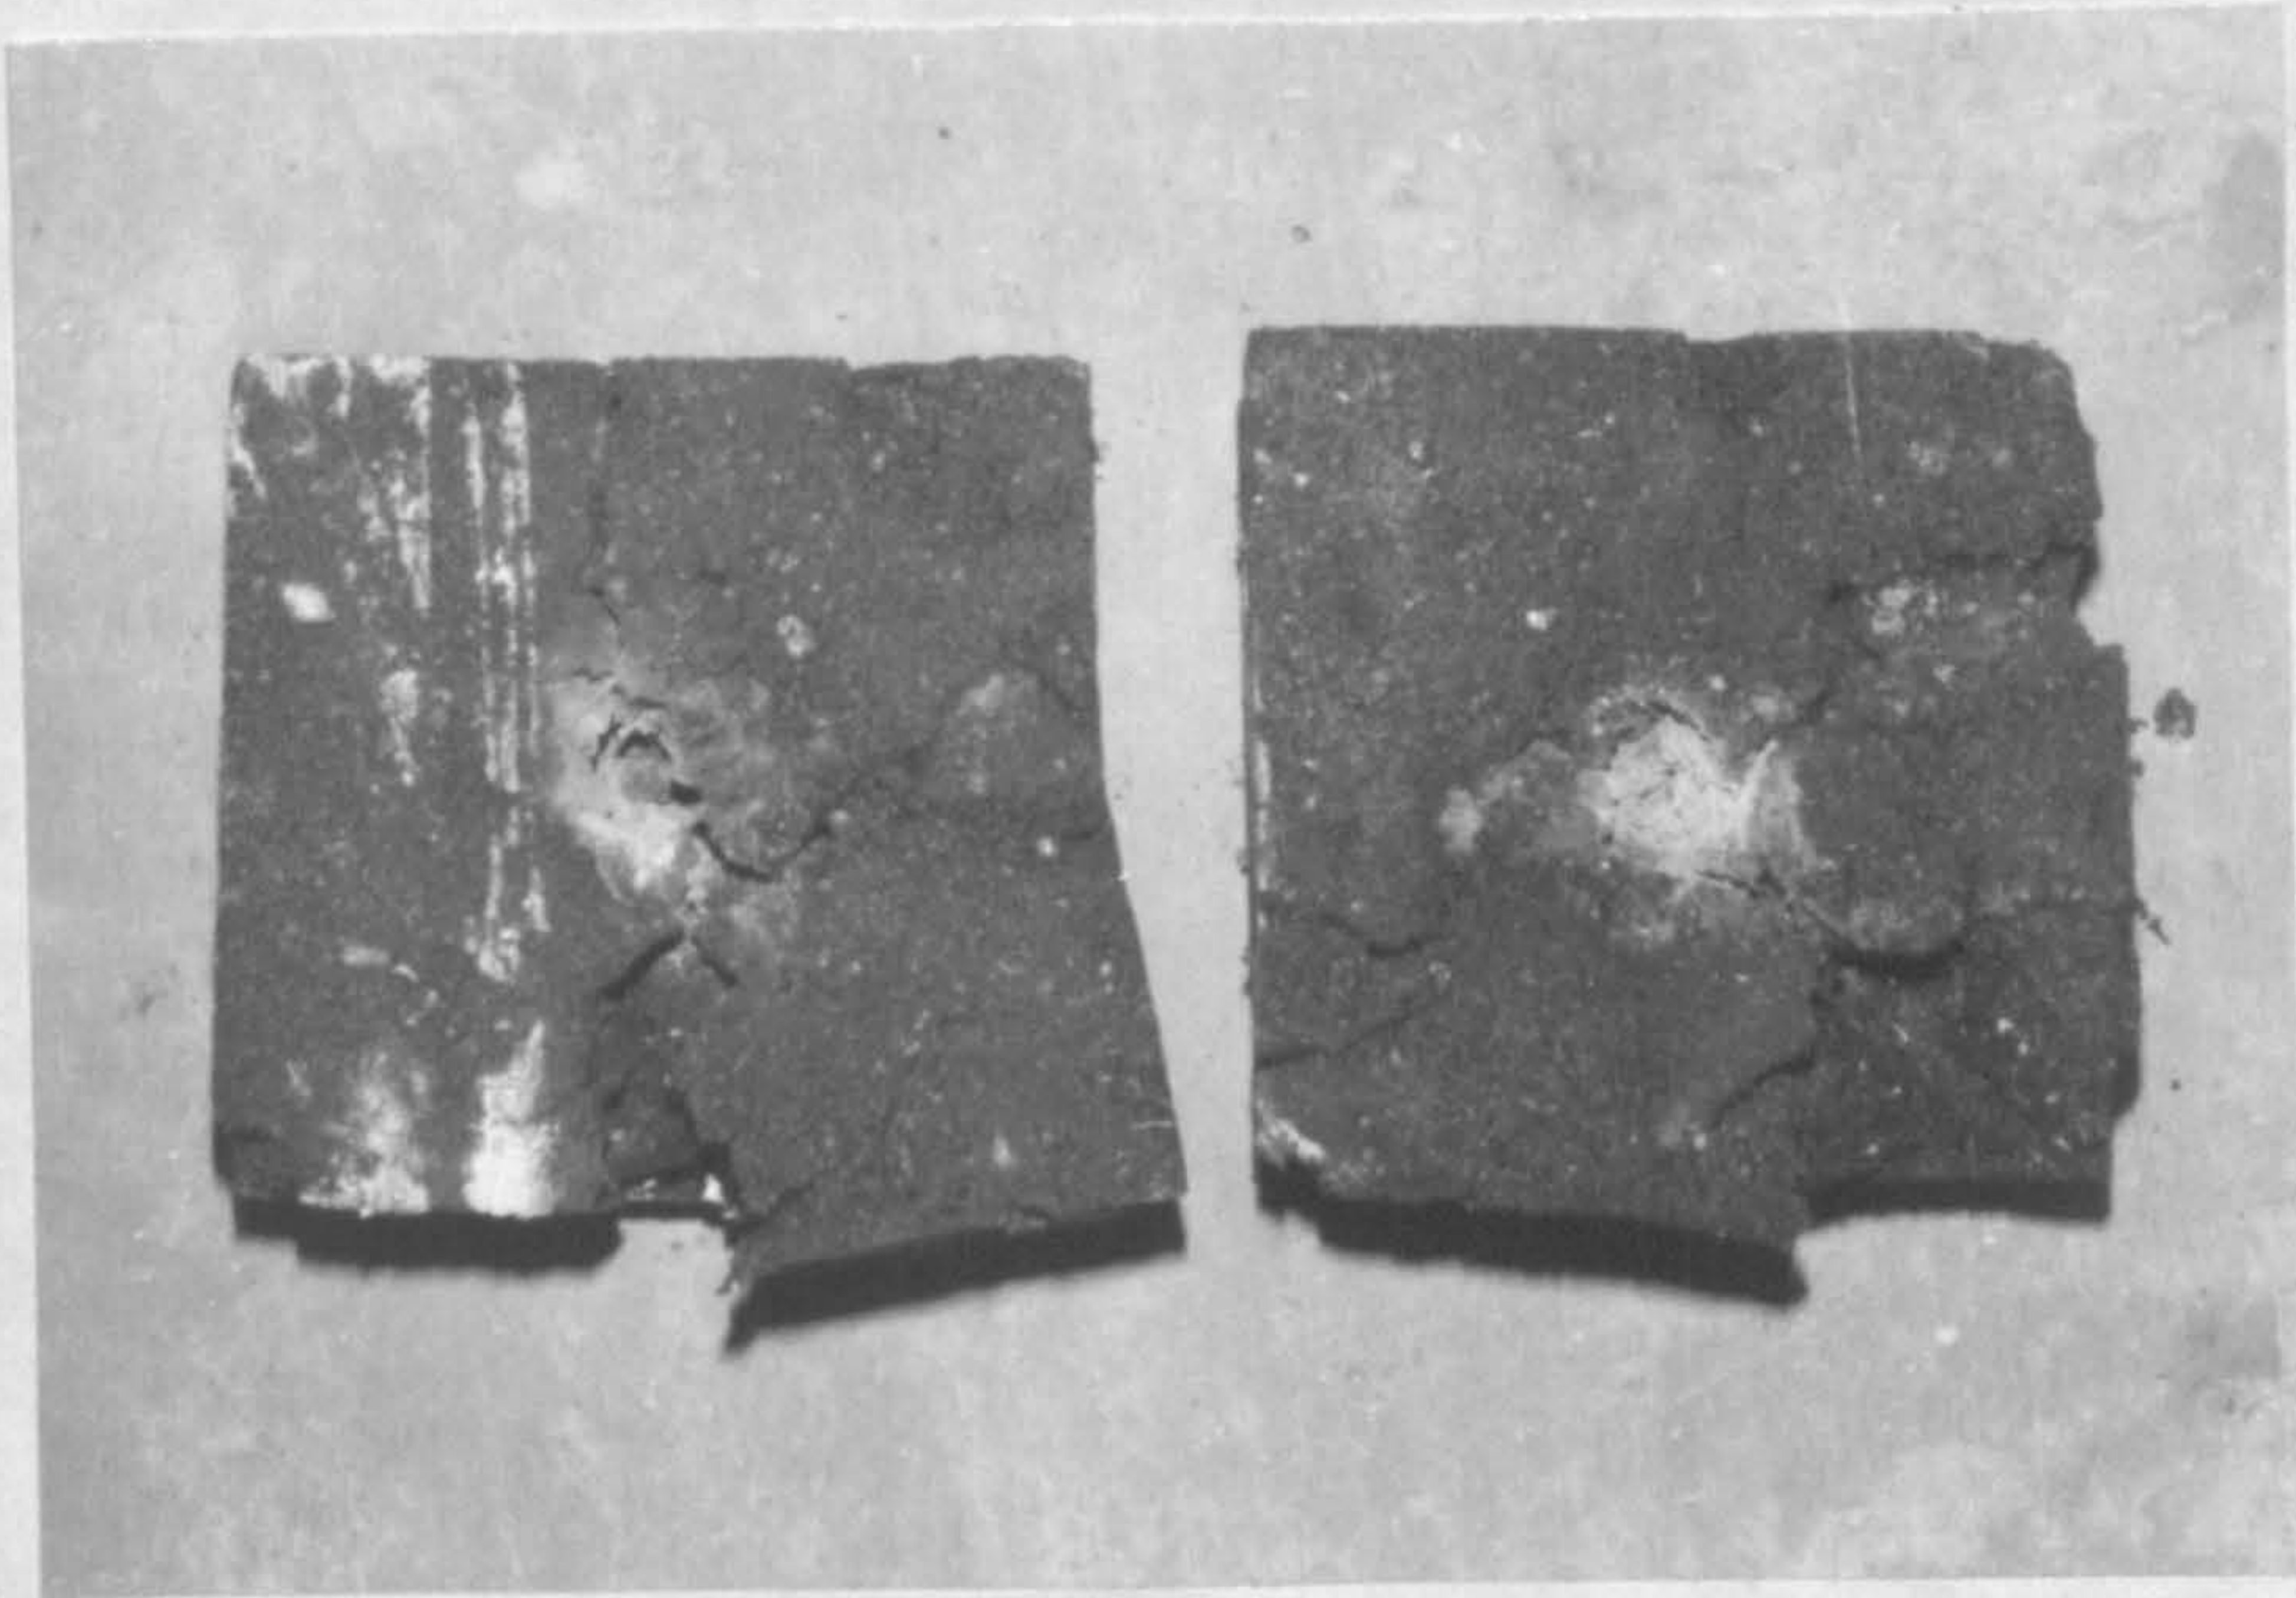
TYPICAL IMPACT FACE DAMAGE, SERIES 15
